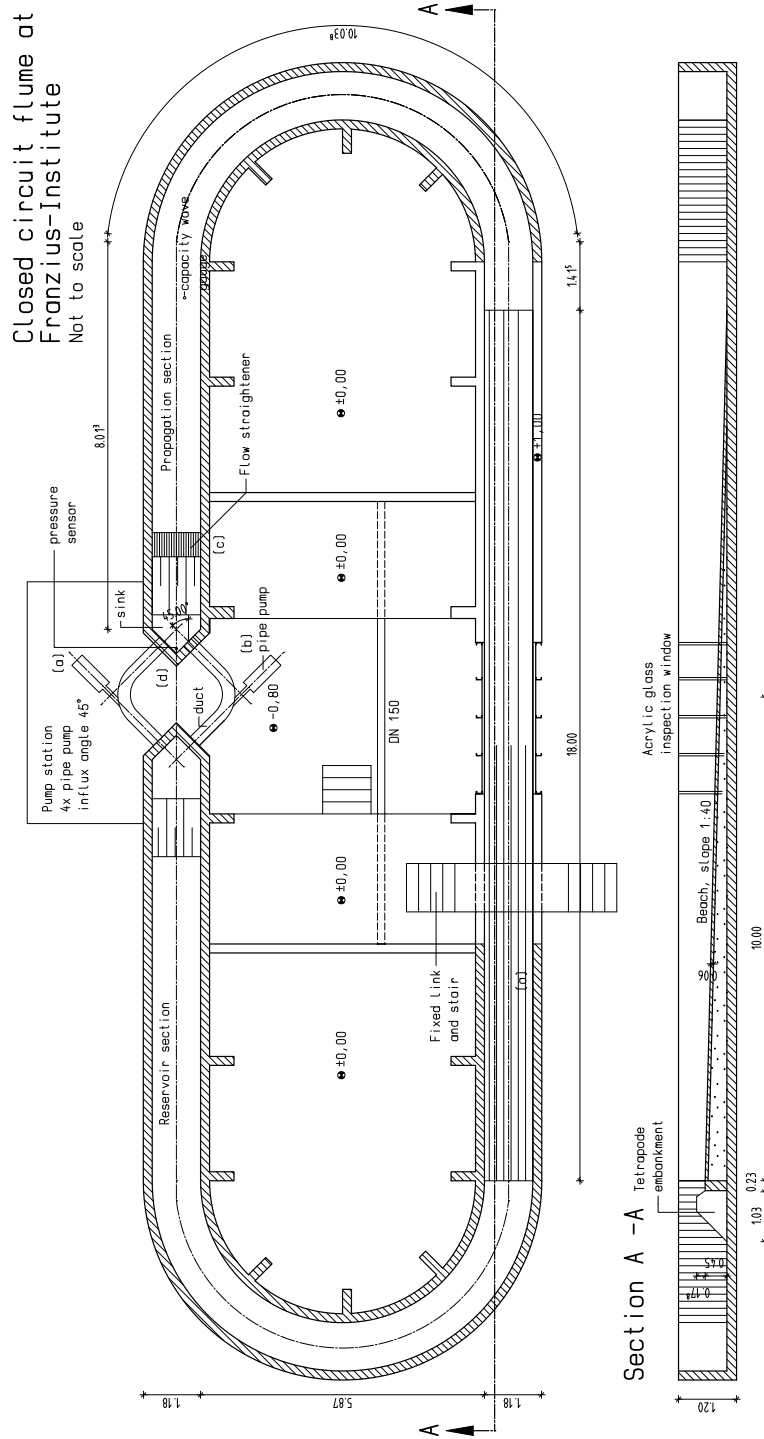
Technical drawing of the closed-circuit flume, plan view of the facility and a cross section of the ramp
